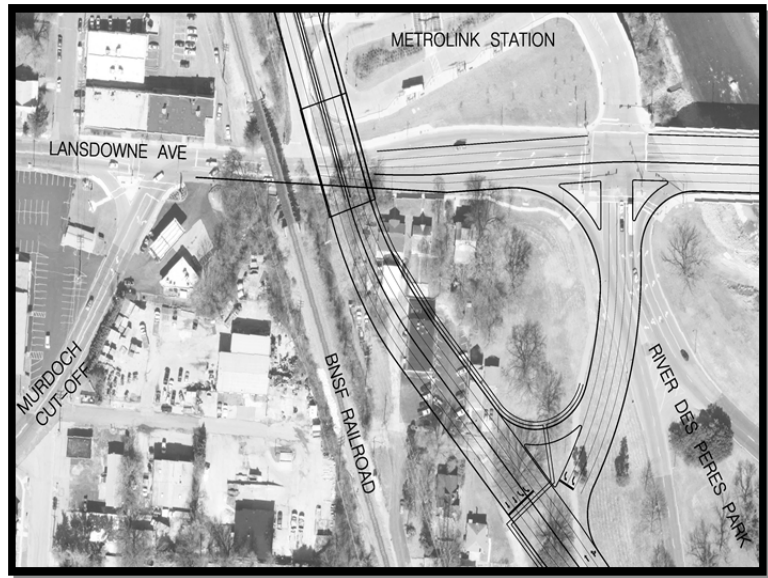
Lansdowne Avenue – Connector Roadway Intersection
